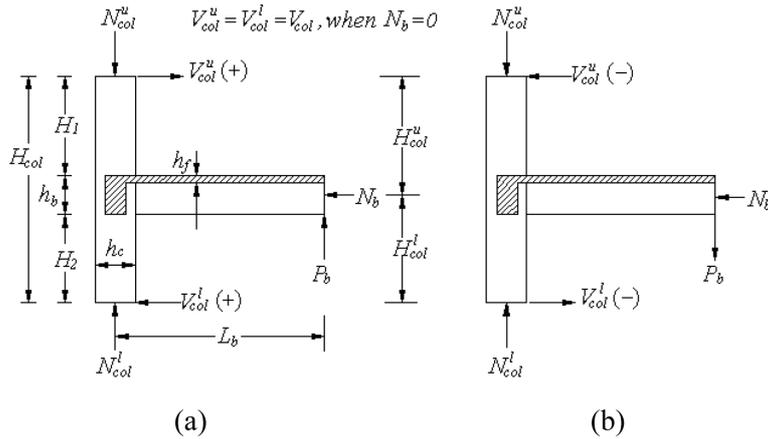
Force diagrams of exterior connection: (a) under forward loading, (b) under backward loading
